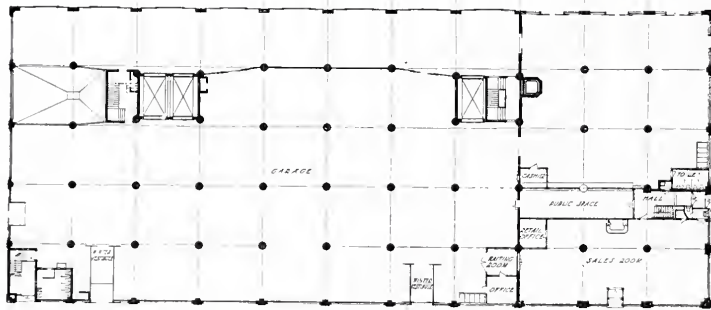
First Floor Plan, Ford Motor Company, Omaha, Neb.
